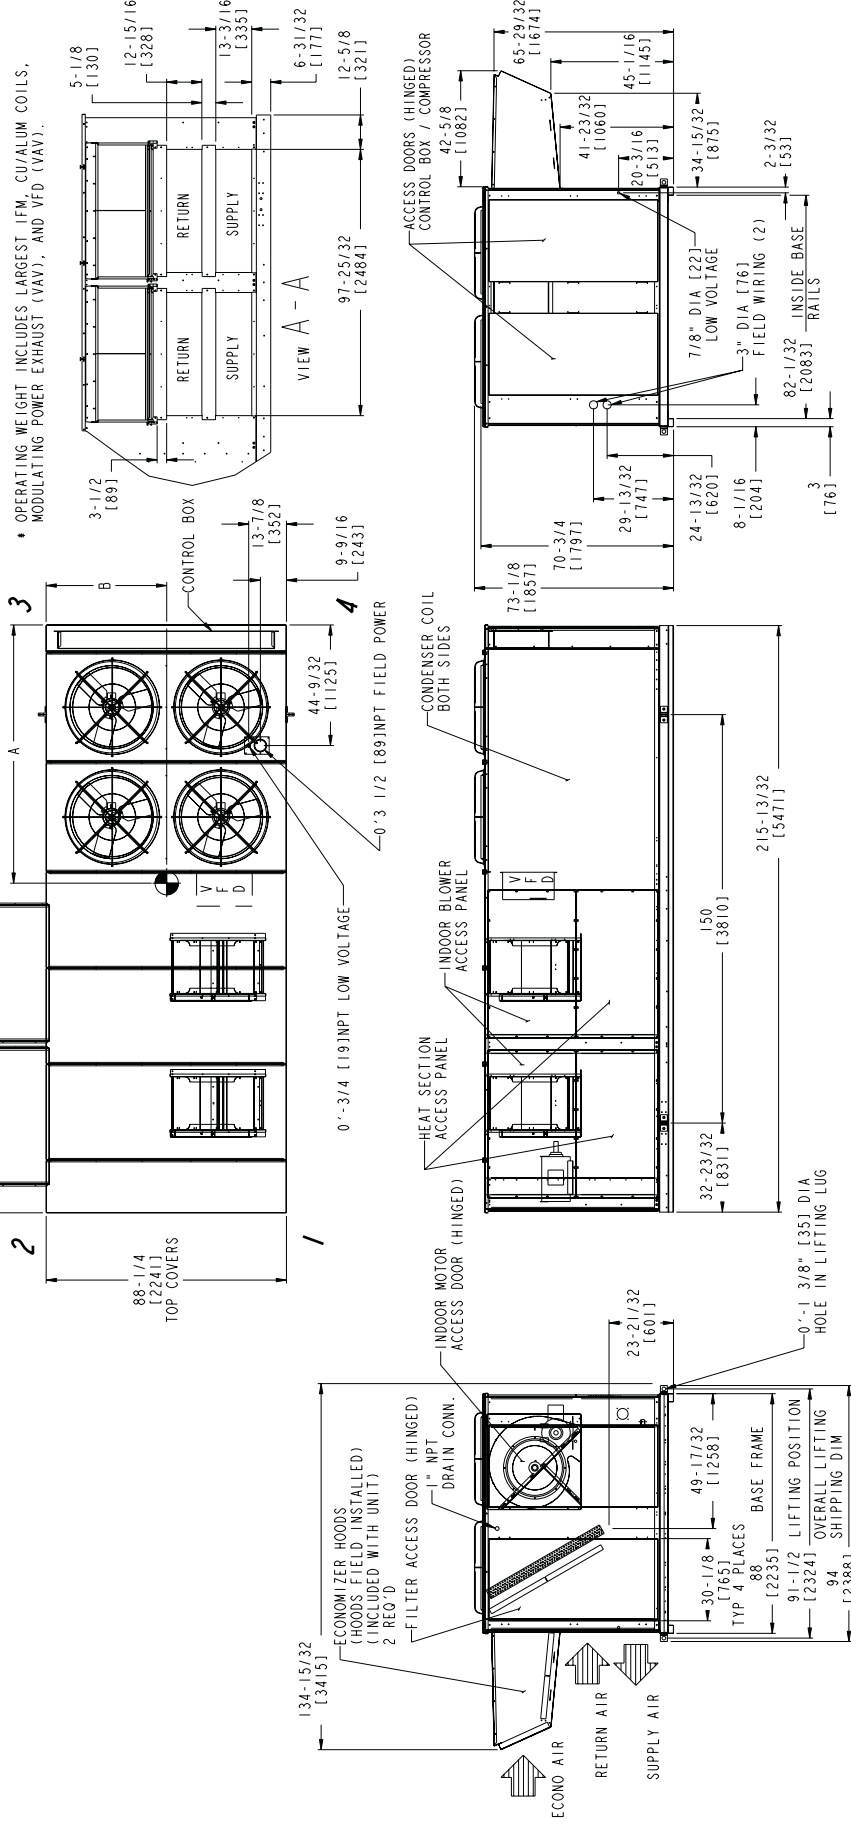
Base Unit Dimensions — 50AW,AY020-030
